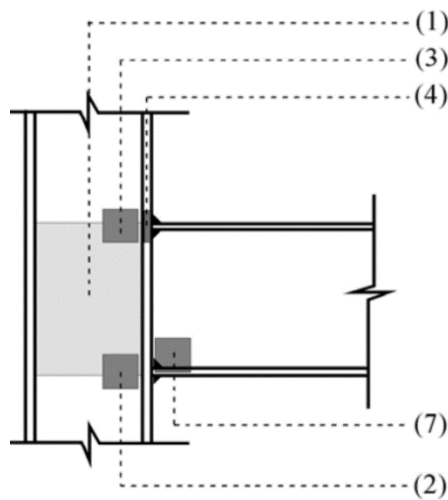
Components of full weld connections (Eurocode 3)
